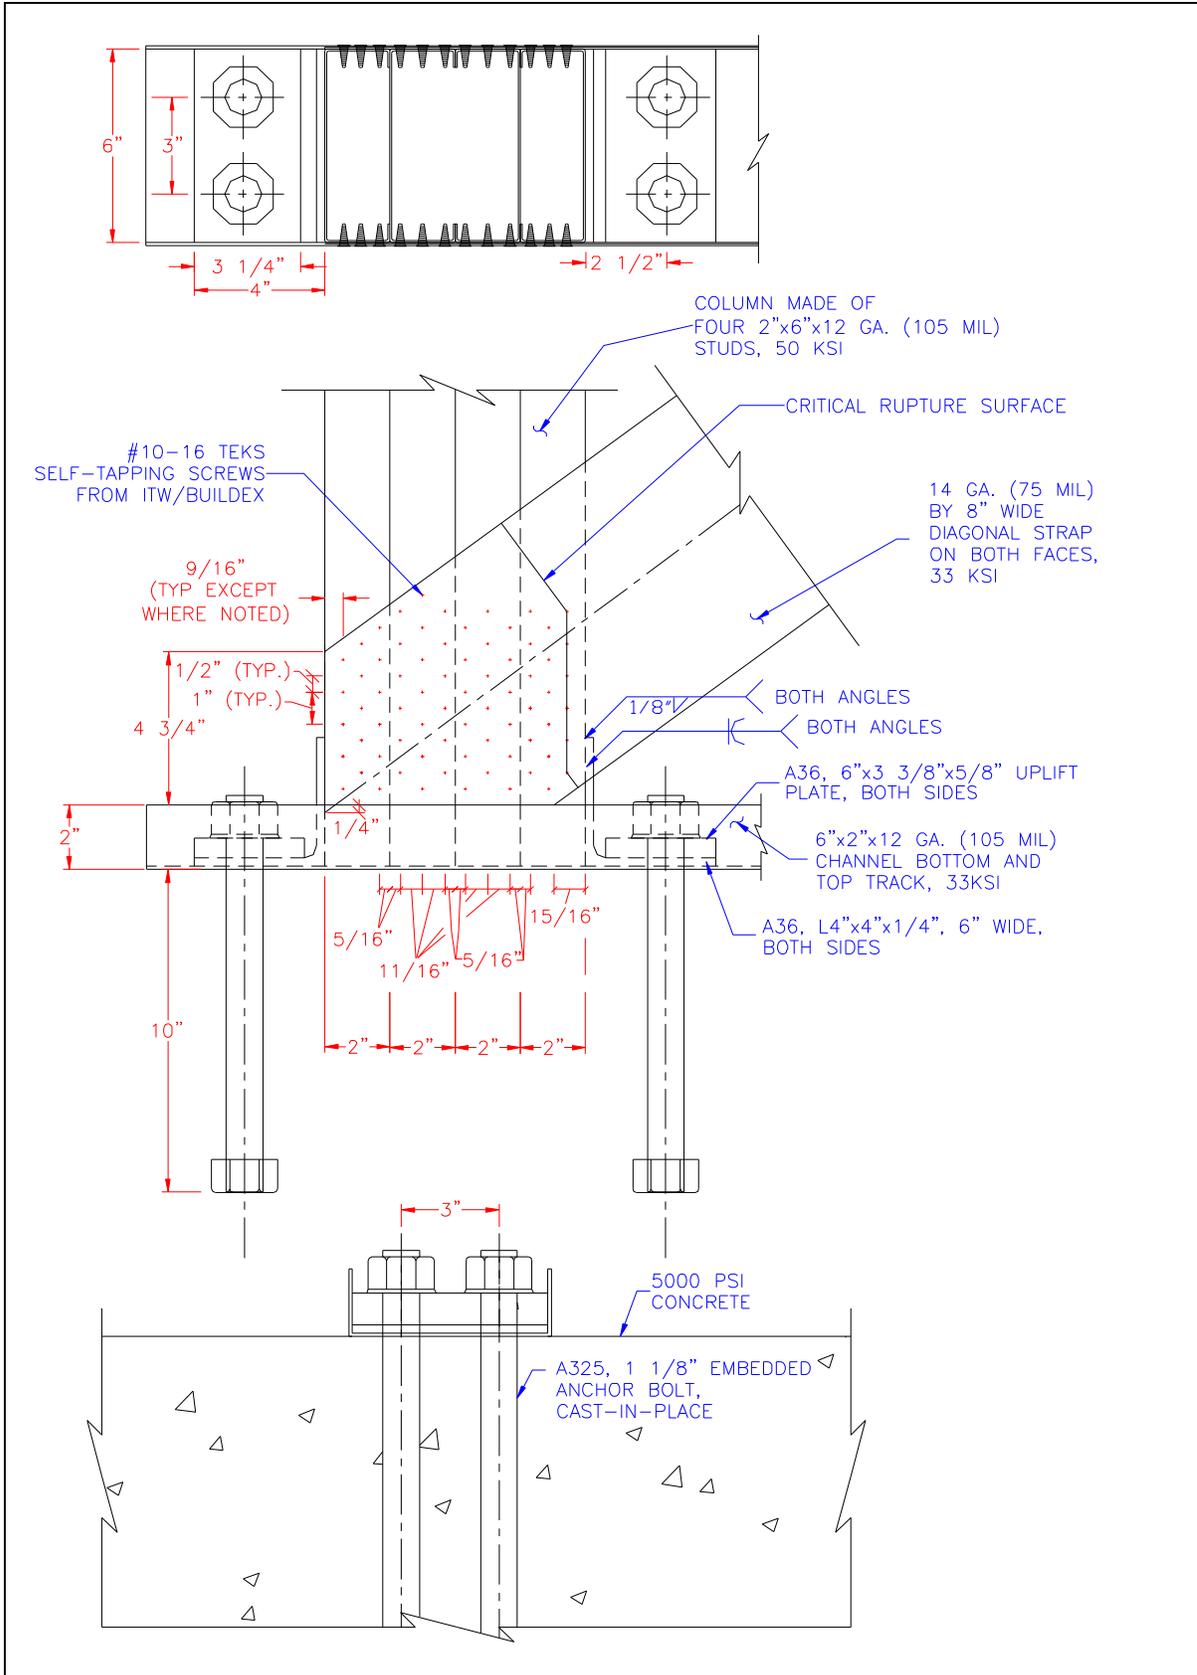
Example connection/anchorage detail – 5th row of Tables D-5, D-8 – D-17.
